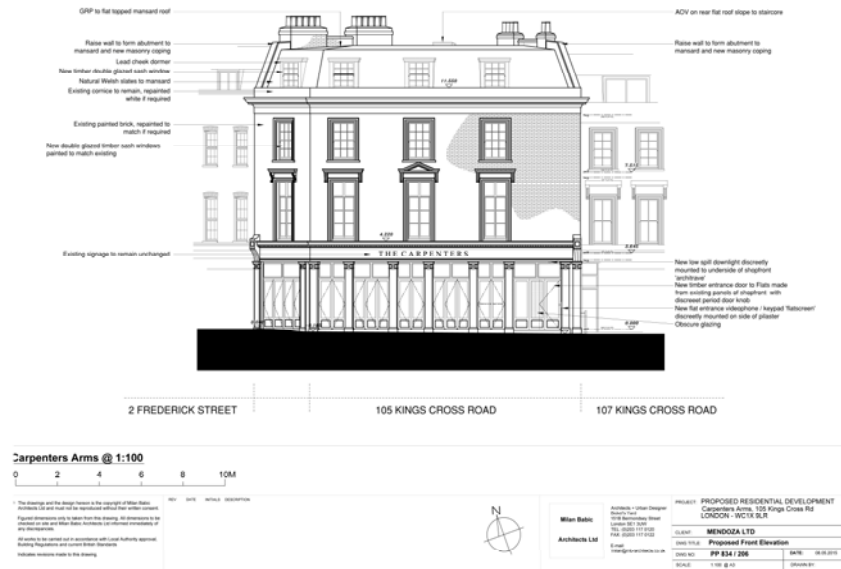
Proposed Front Elevation showing the scheme as proposed.
